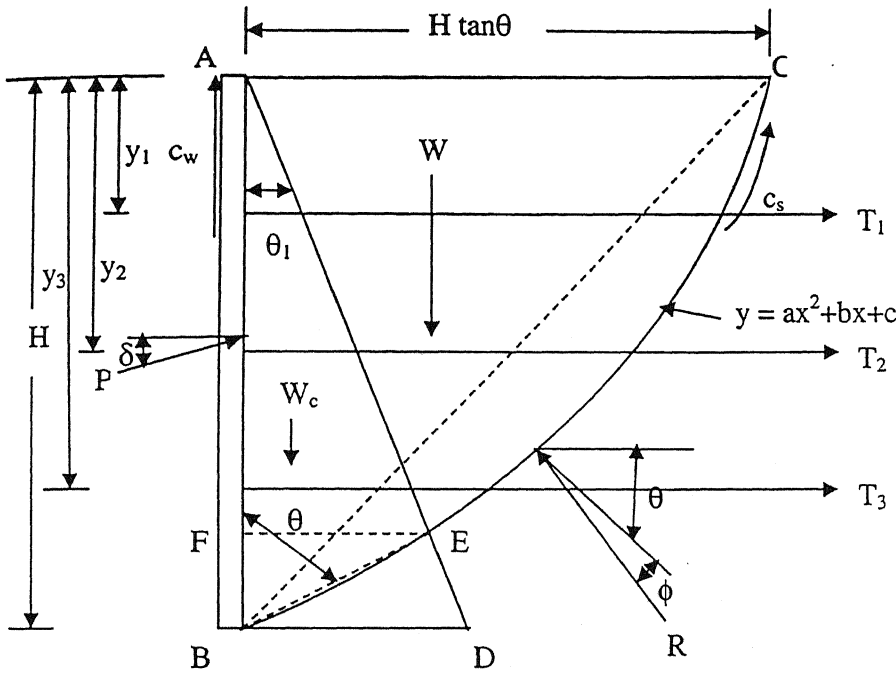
Forces acting on counterfort retaining wall (without loading, reinforced backfill)
